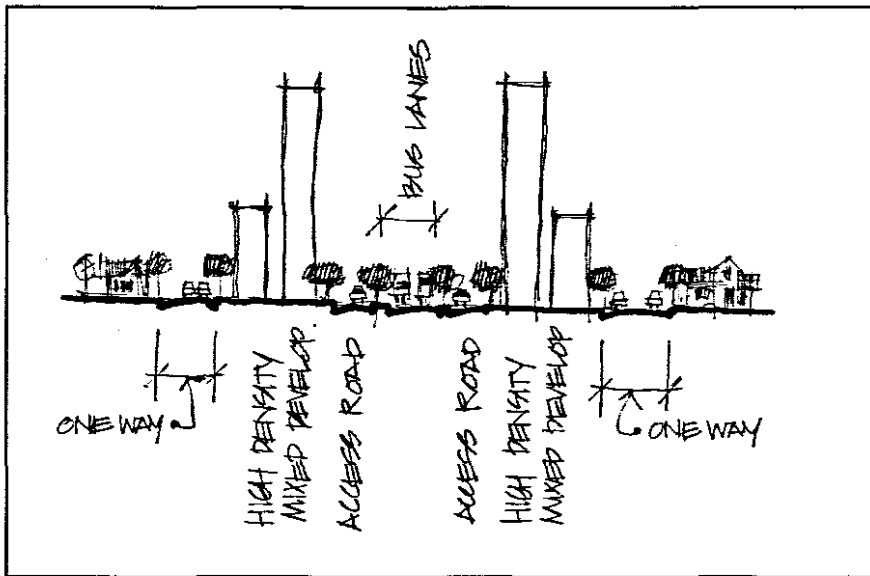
Cross section of a structural corridor (Source: National Department of Transport, 2001: 2-44).
